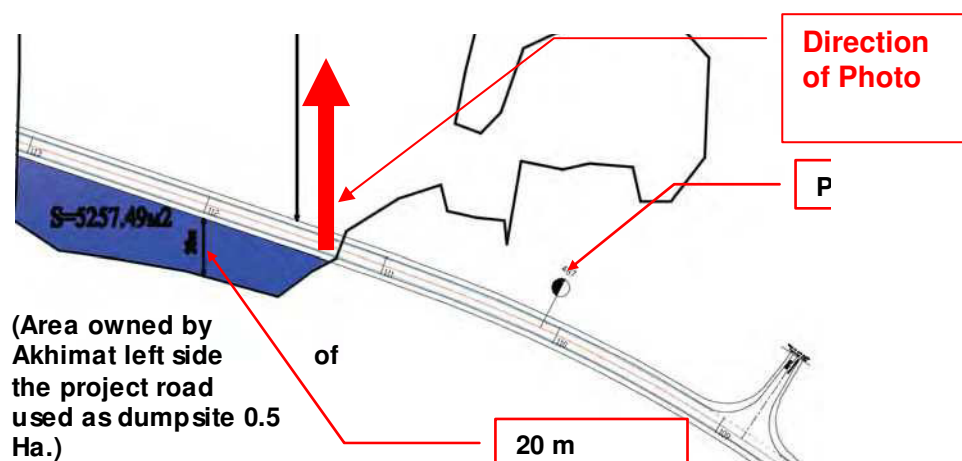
Layout of the Dumpsite with the Photo Project Road (4)
